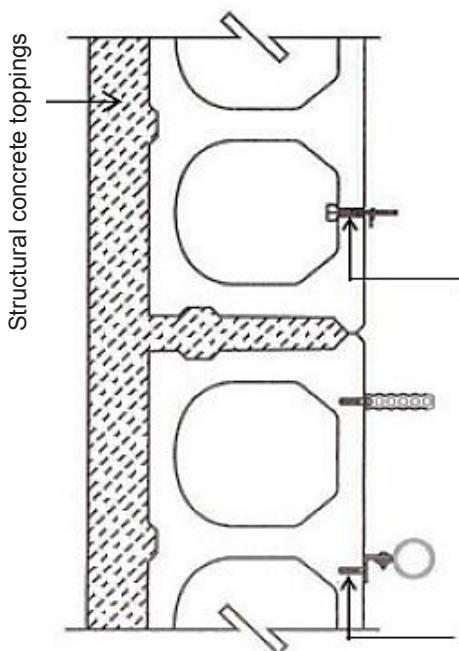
(a). Light duty fastening – light hangers using drill in anchor bolt.
